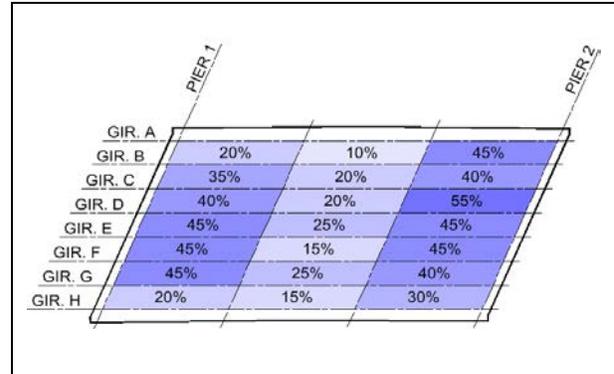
Bridge 90/105.5N Crack Intensity Diagram
